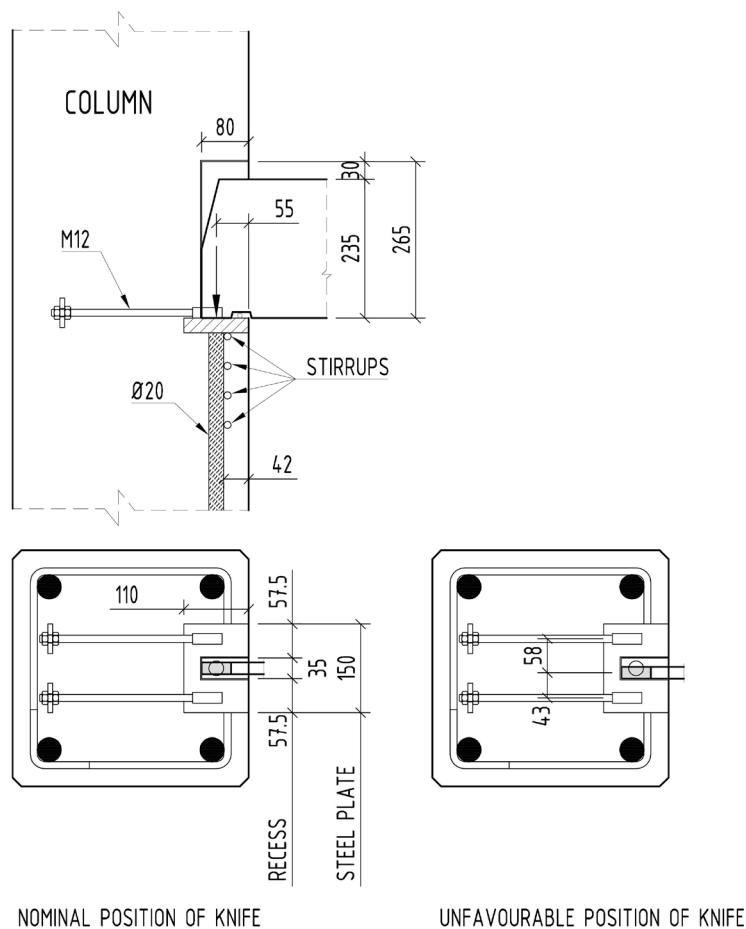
BSF300 column unit. (Centre stirrups are not illustrated.)
